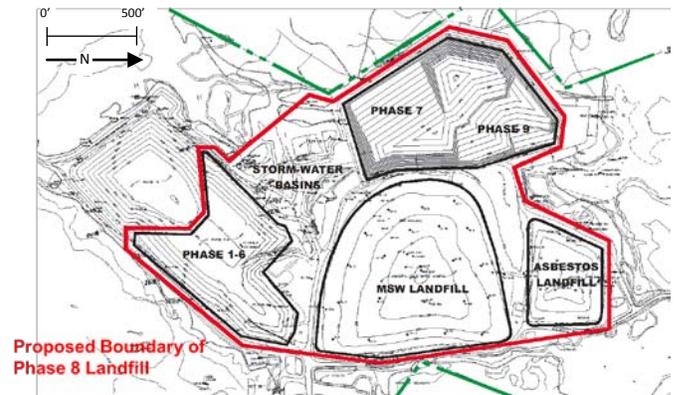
Plan view of MSW Landfill and surrounding waste disposal units constructed and filled after 1989 slide.
